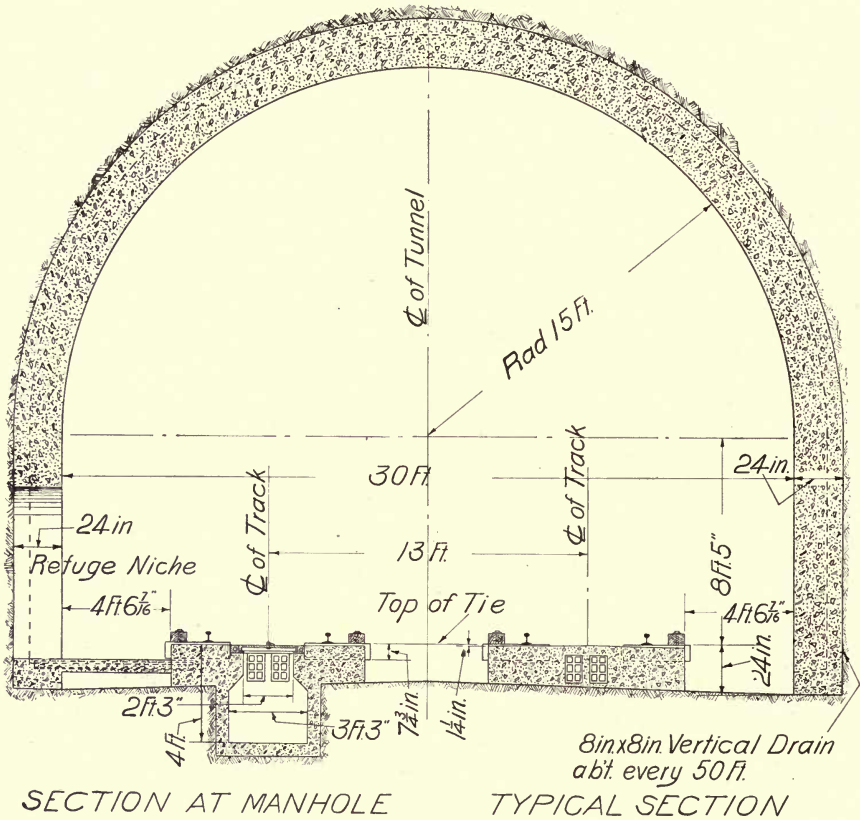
CROSS SECTION, NEW BERGEN HILL TUNNEL.
